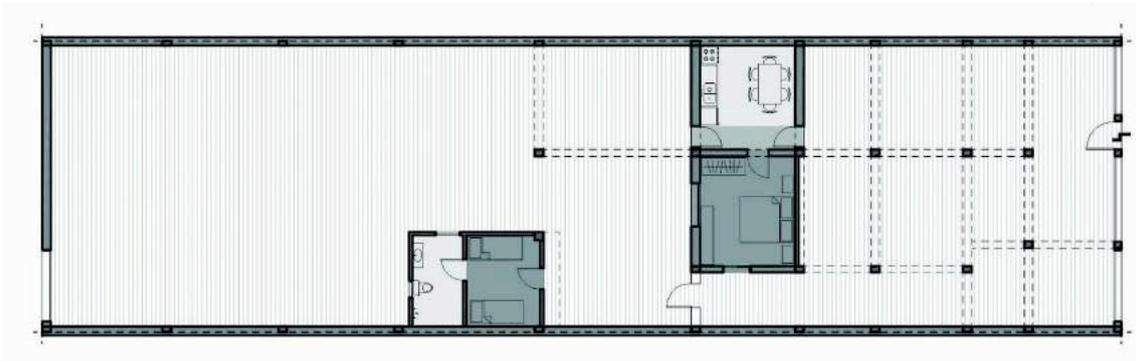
Plan 8: Walls of part of the structure, 1991. The González have put in a kitchen-diner (in light grey) and added a bedroom (in dark grey) to the structure completed by Elisa.
